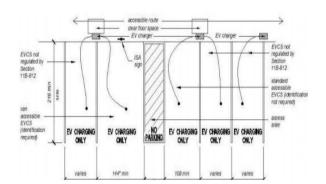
Sample layout with 5 EV Chargers, 1 Van Accessible Stall, and 1 Standard Accessible Stall
